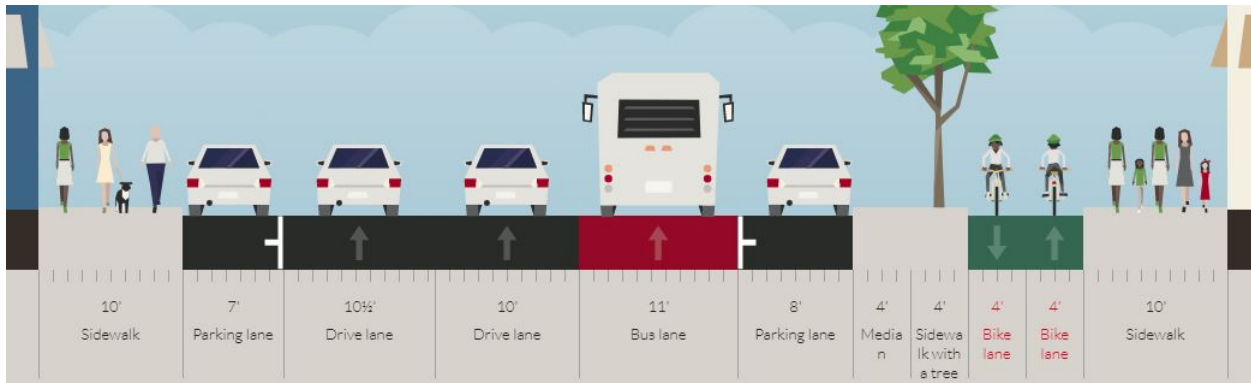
Typical Cross Section of Folsom Street between 8th and between 6th streets, looking east
